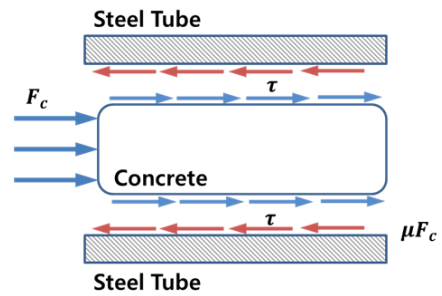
Load transfer between filled concrete and steel tube in CFT
